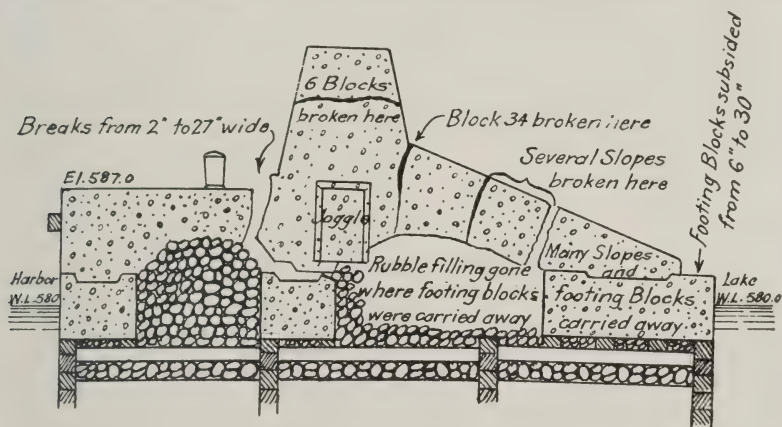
Typical Section of Main Breakwater showing Damage done by Storm Nov. 1913.
